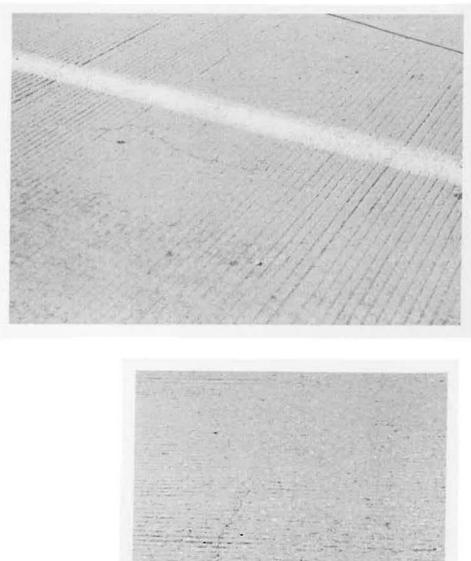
Closeup of deck. Structure C-17-BQ. April, 1990. Low slump concrete with fly ash.
